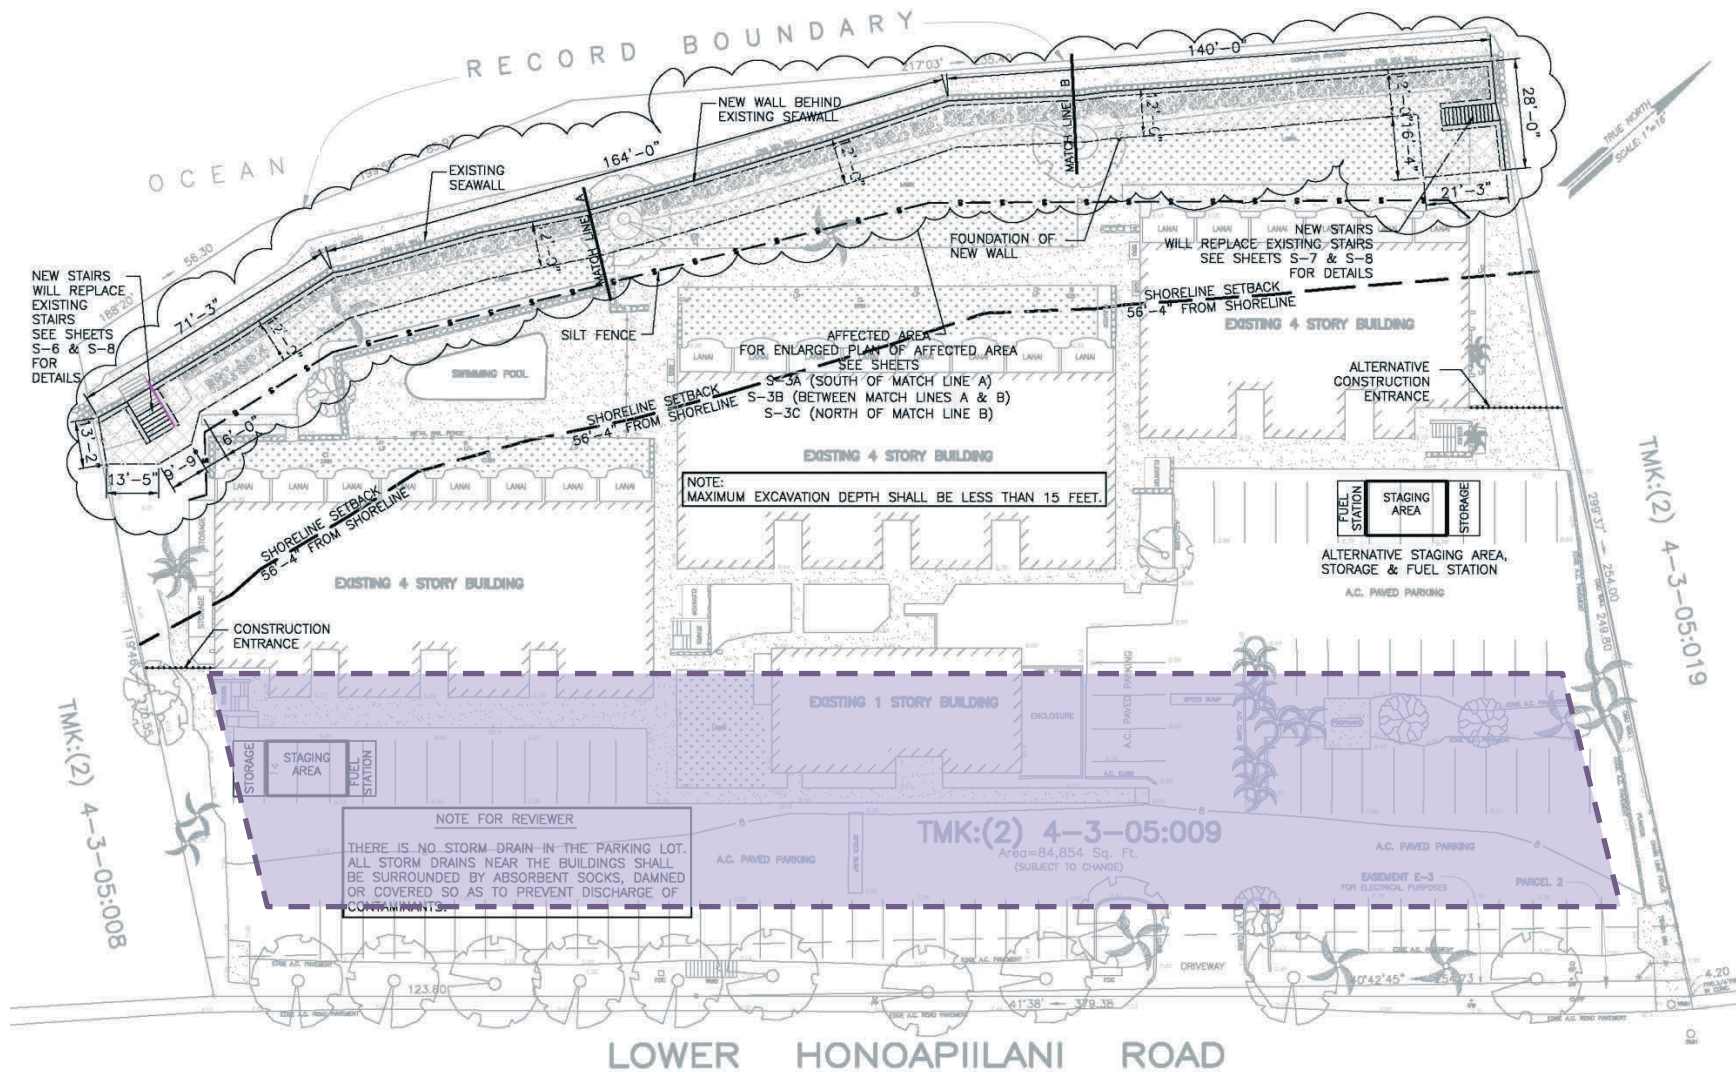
The footprint of a 4+ story condominium building which covers less than 30,000 square feet is highlighted above with dwelling units above ground floor parking. The location avoids most, if not all, coastal hazards associated with 3.2 feet rise in sea level and complies with land use entitlements including 20' front yard setback, 15 feet side yard setback, 90% floor area ratio and 35% lot coverage.
